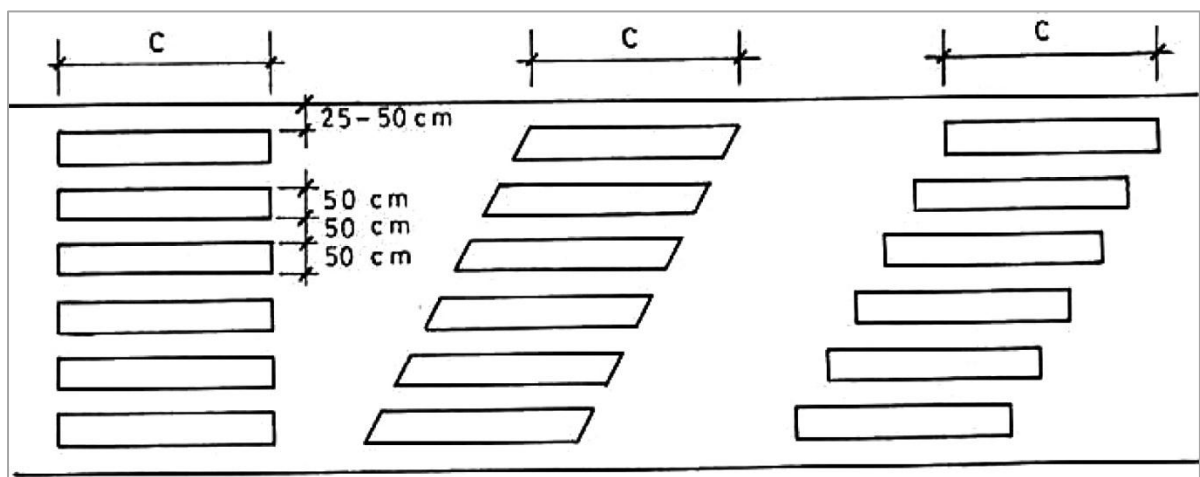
/9: Marking of Standard Pedestrian Crossing [4, p.V 26]
